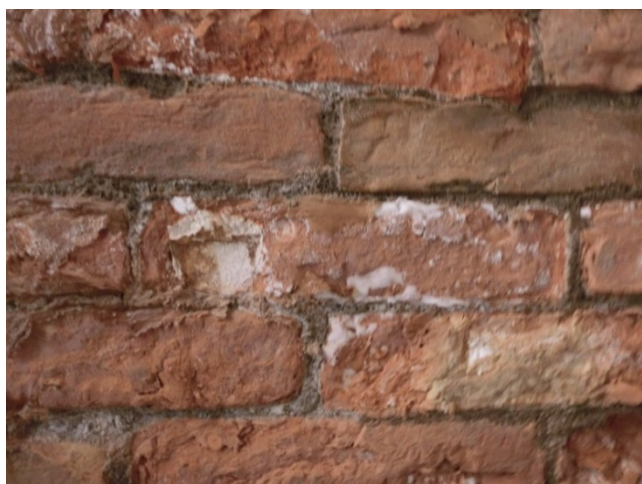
Damages to brick walls from salt intrusion
